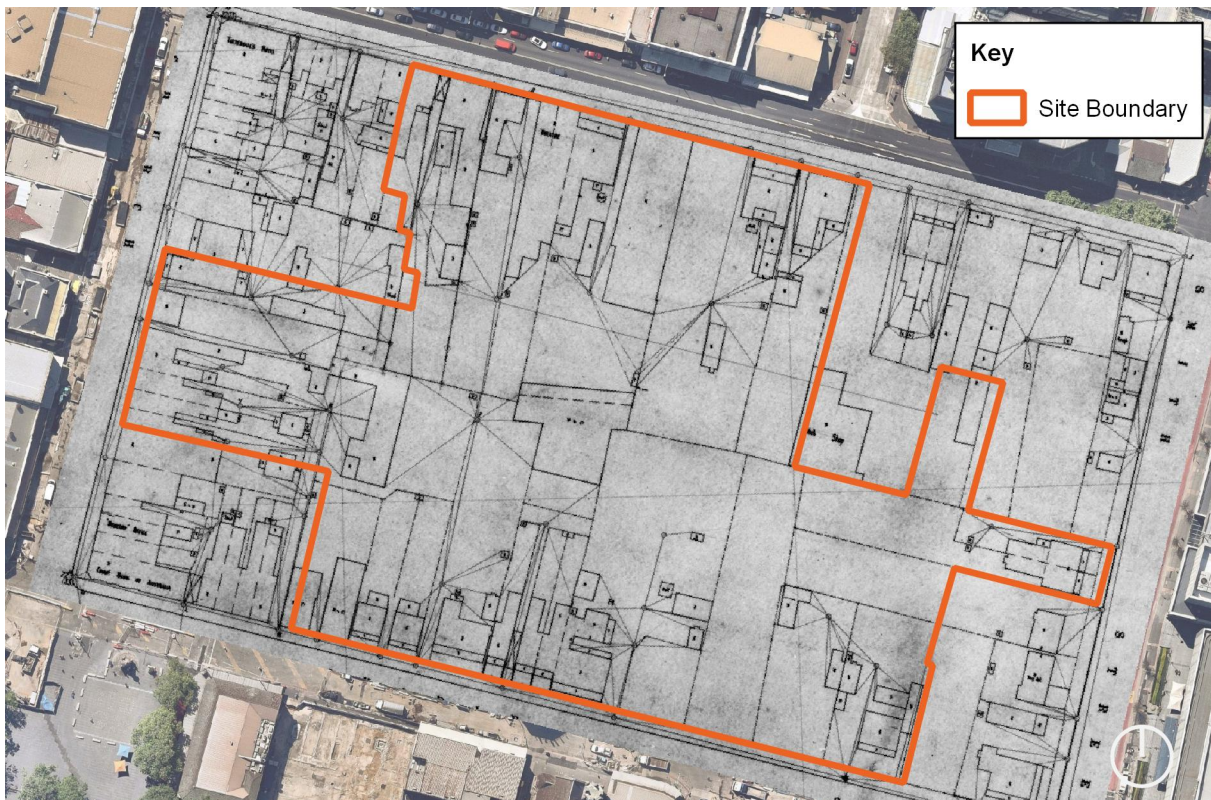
1894 Water Board plan showing details of the sewer and stormwater connections to the various houses, shops and structures fronting the streets and outbuildings to the rear. (Source: Sydney Water with GML additions)
